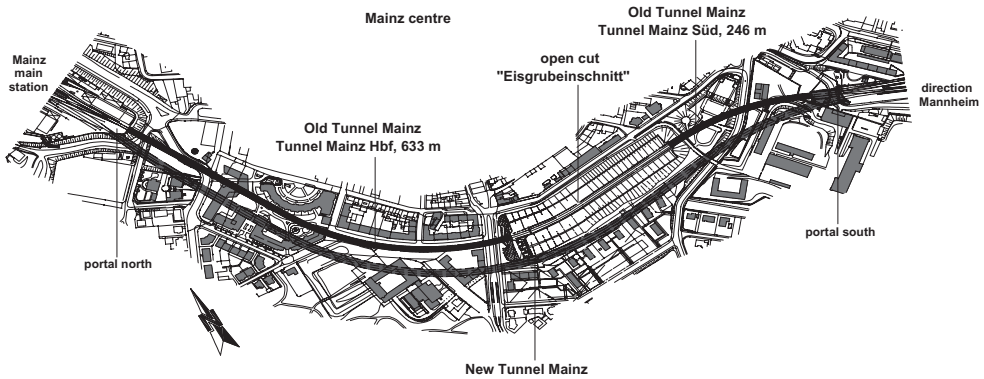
Plan view tunnel situation (Quick et al. 2001).
